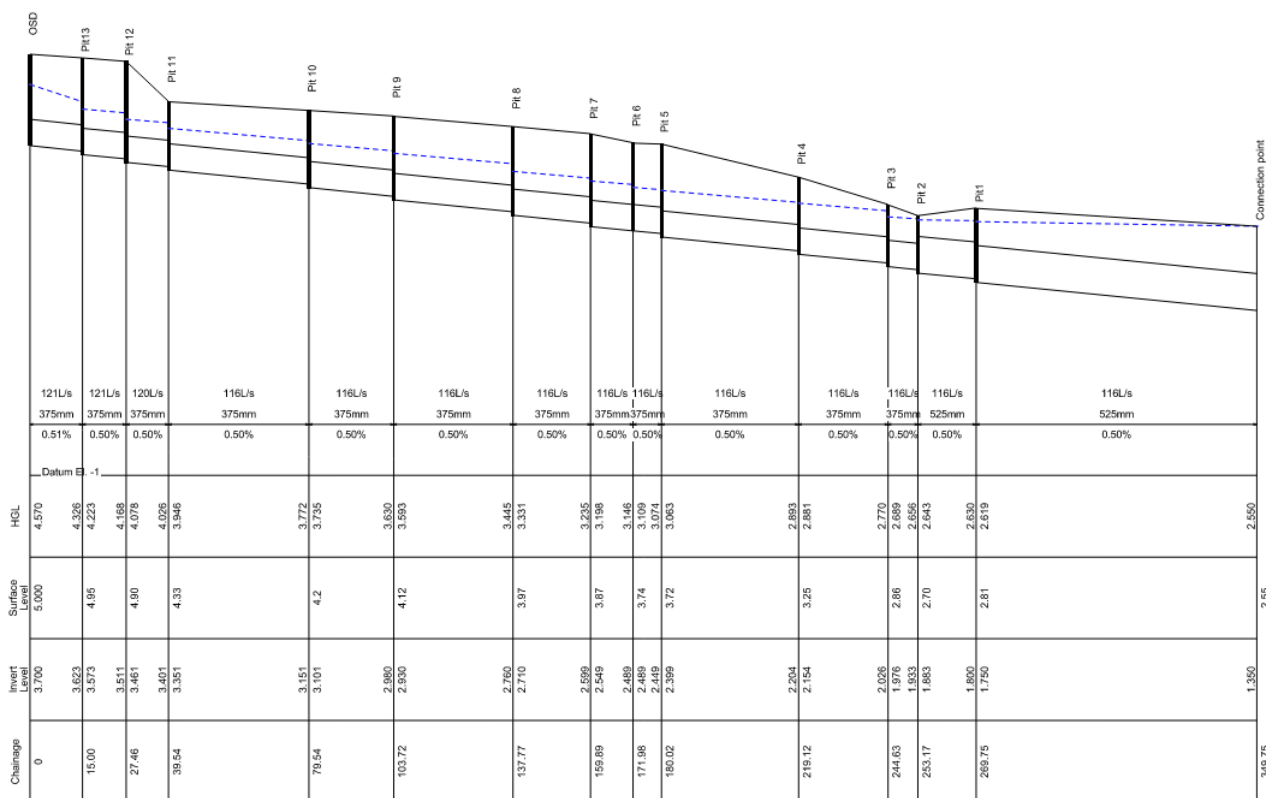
Longitudinal Section of Proposed Stormwater Pipeline – 1% AEP Event (Including Hydraulic Grade Line)
